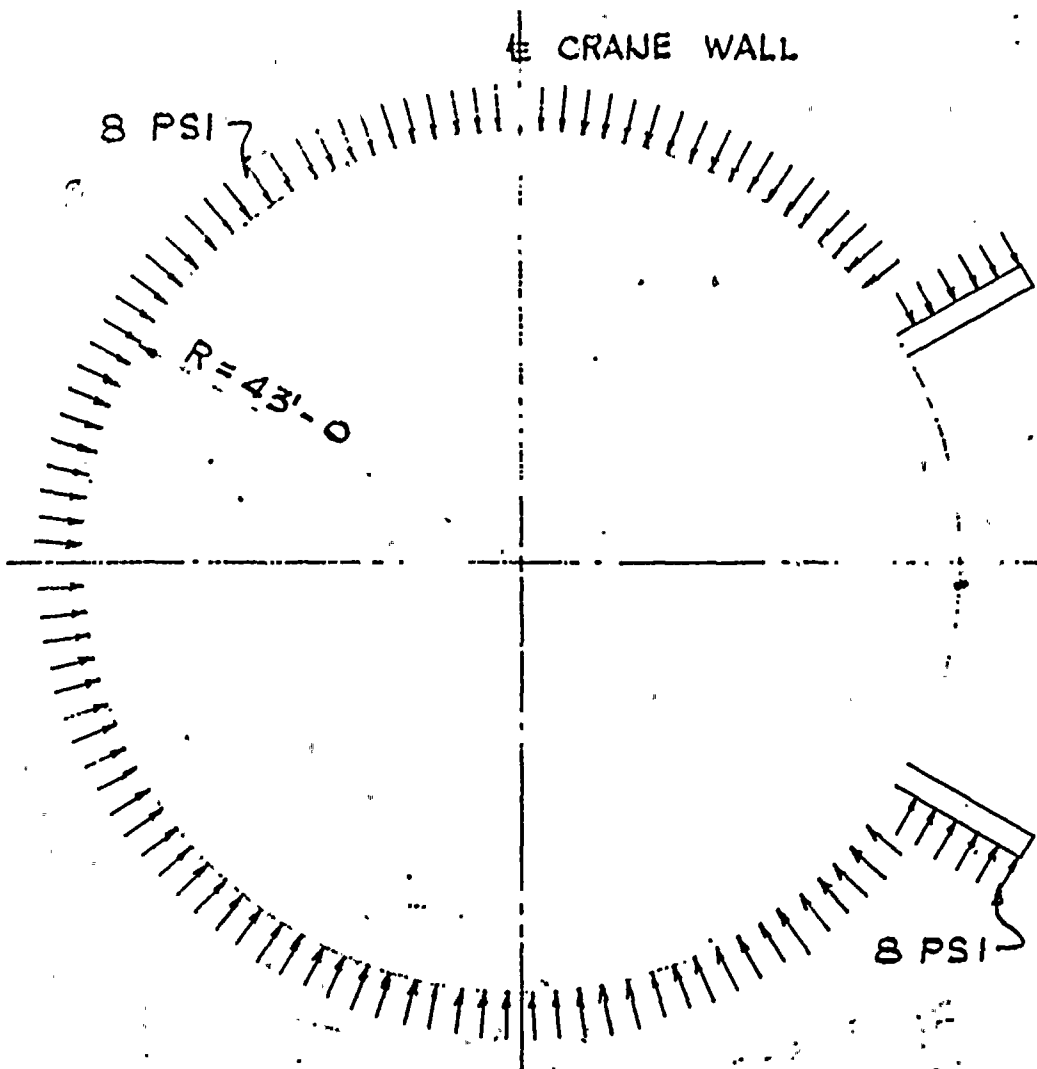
26. 2-1 LOADING DIAGRAM OF UPPER CRANE WALL
